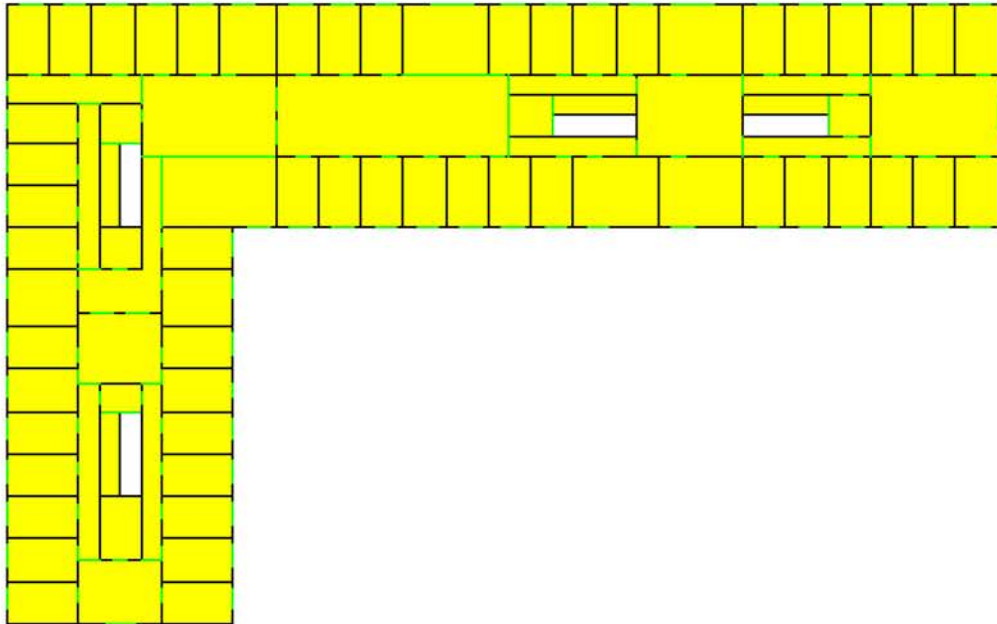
Simplified room layout for 50 George Square 4th floor
